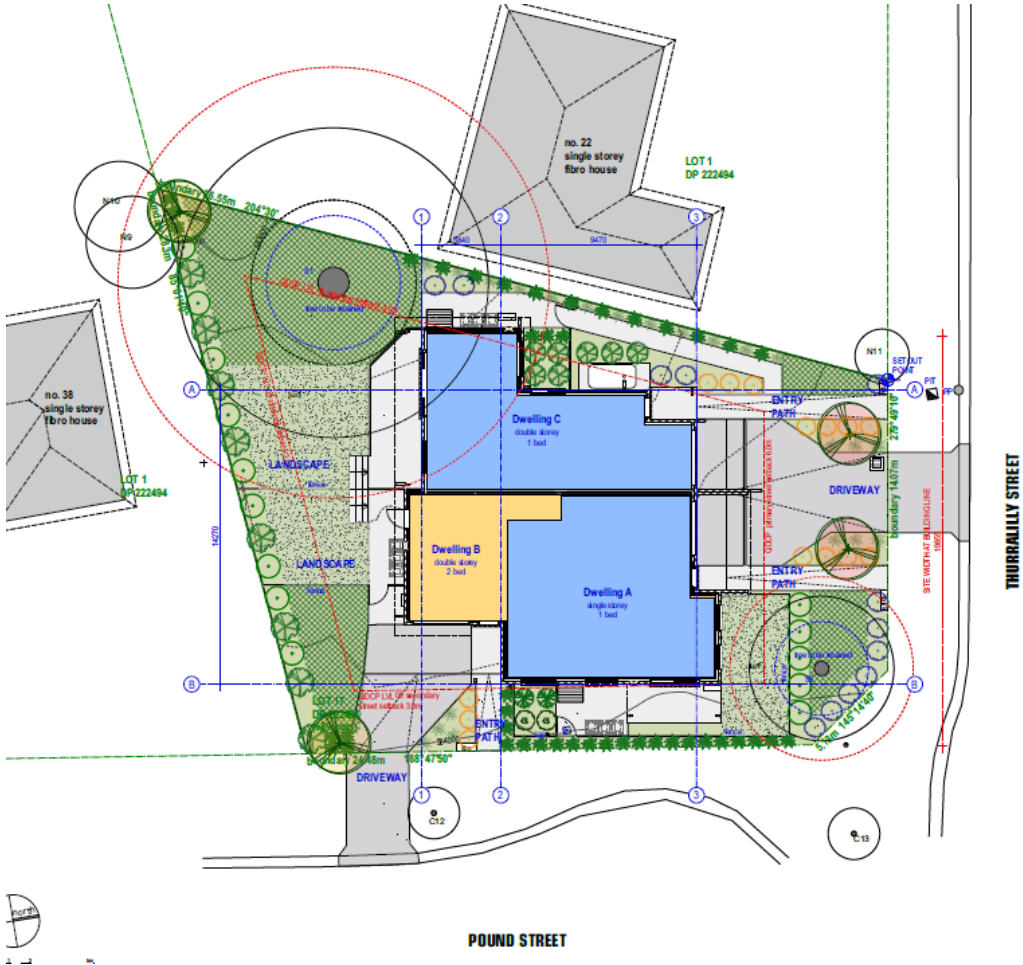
Extract of Site Plan (Source Kennedy Associates Architects)
